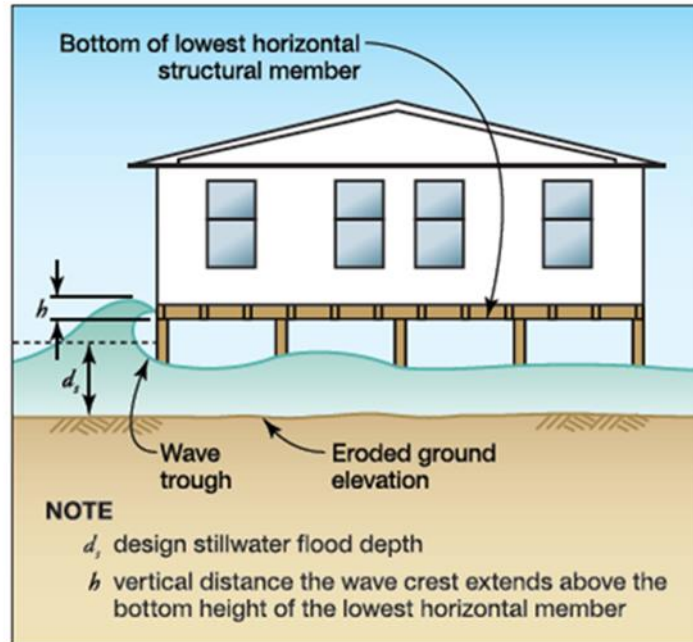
Wave slam due to wave crest hitting side wall of elevated building, from FEMA (2011)
